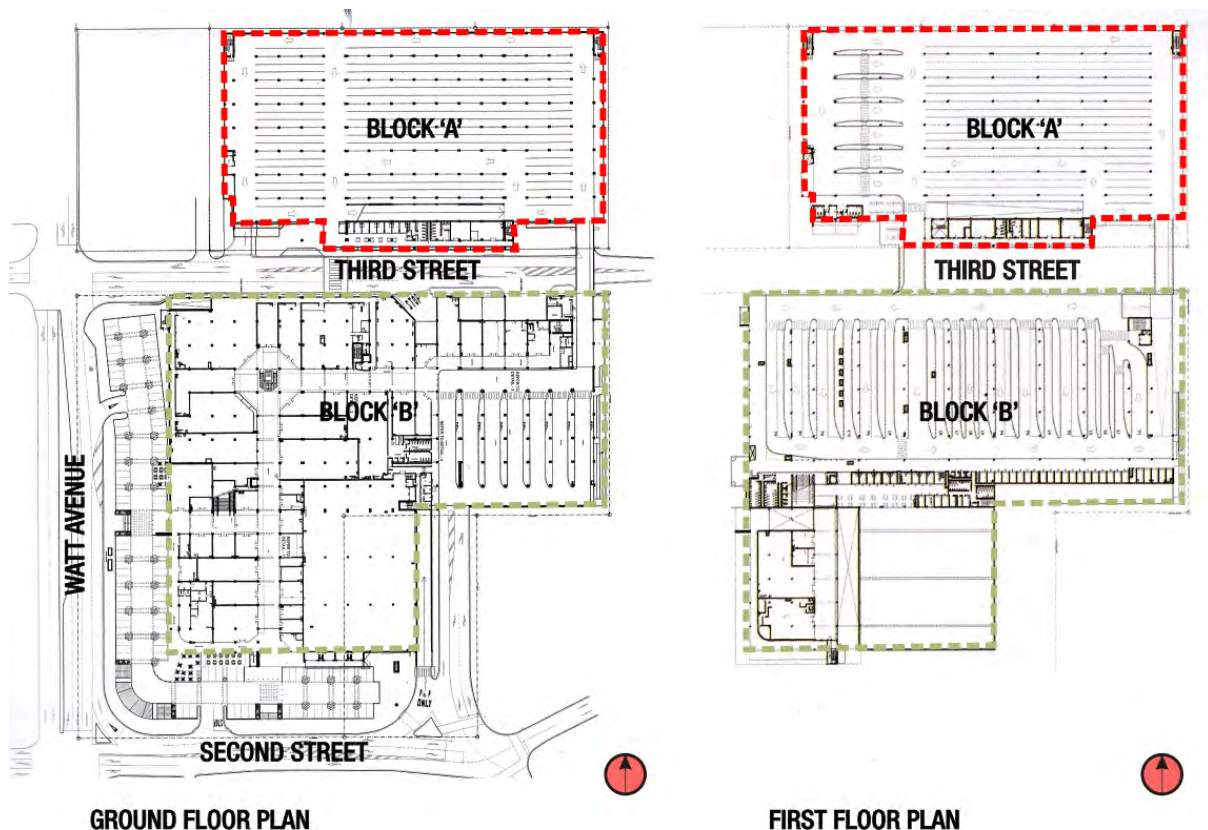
Floor Plans of Pan African Shopping Centre and Taxi Rank. (Truen, 2009: 49)
